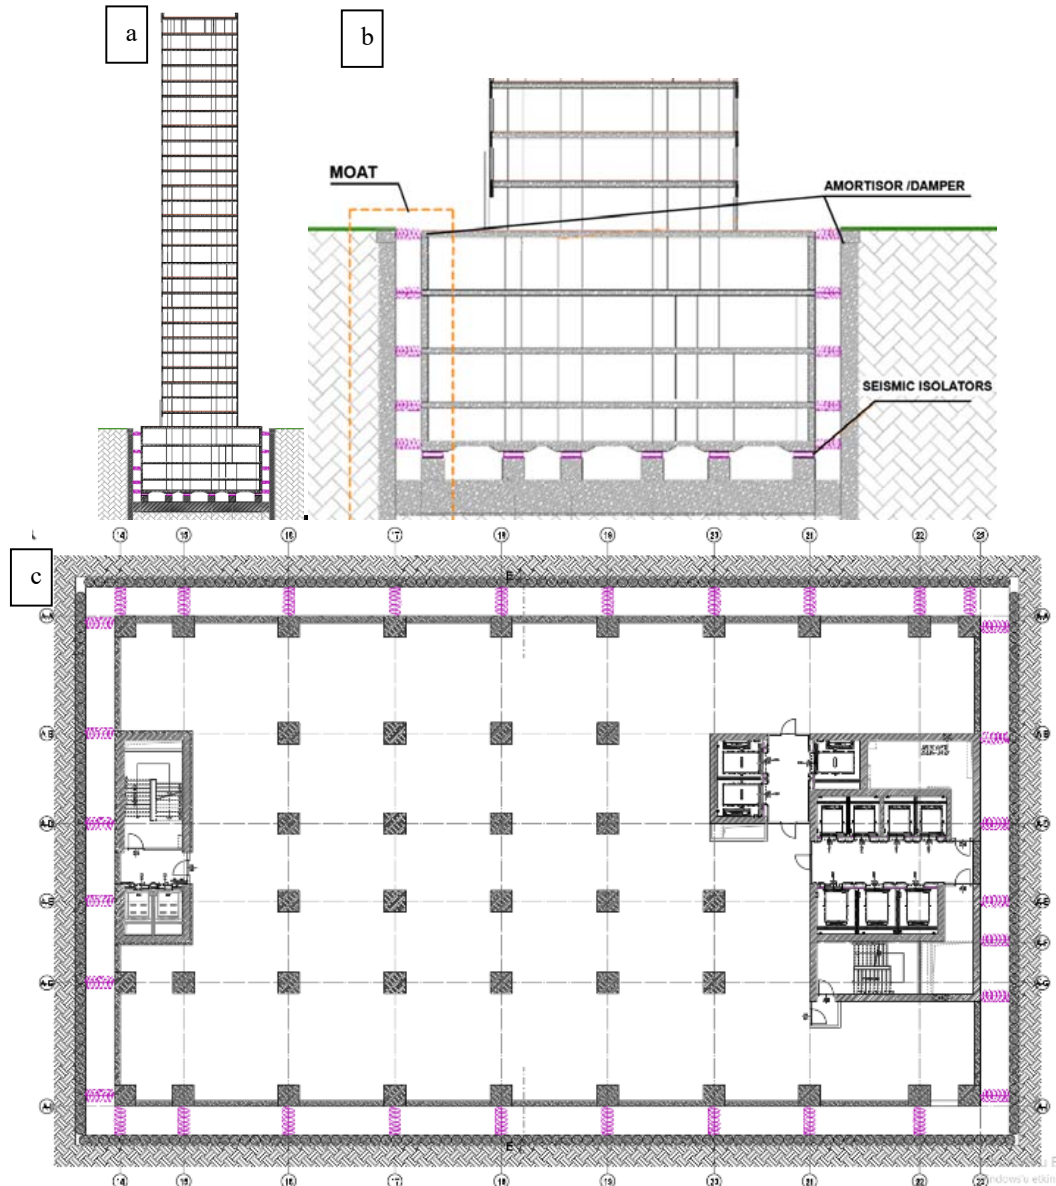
(a) Representation of the proposal diagram in a typical high-rise building section example, (b) Schematic Proposal Foundation Section, (c) Plan
